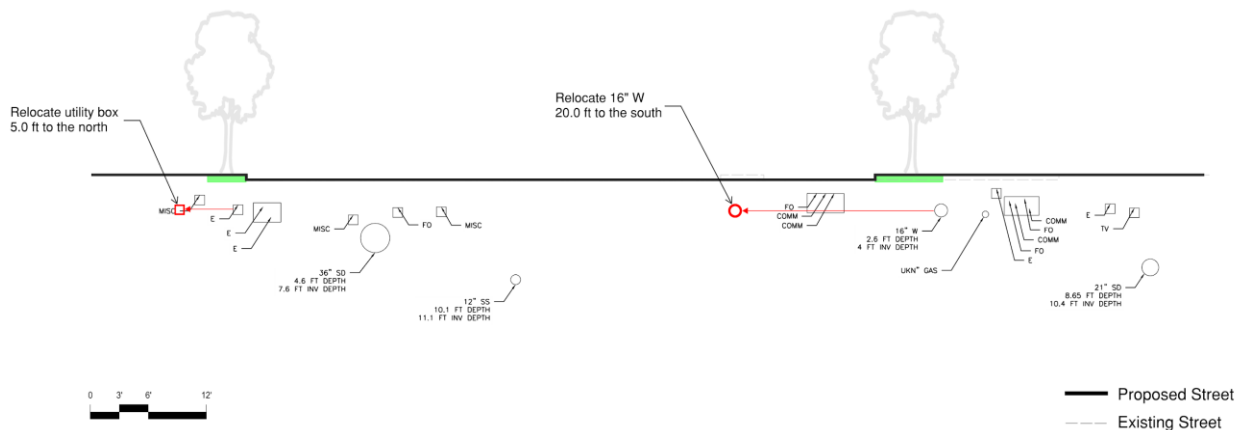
Conceptual Street Section 2. North Montgomery Street - Minor existing utility relocations required
